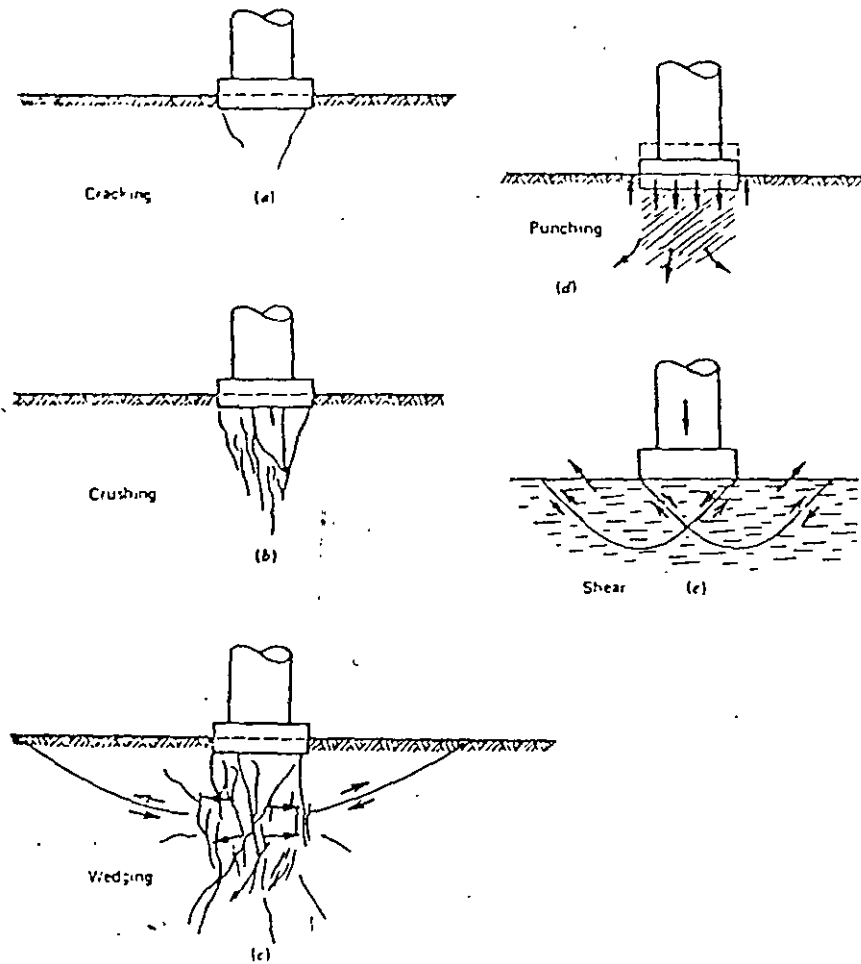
Modes of failure of a footing on rock. (a), (b), and (c) Development of failure through crack propagation and crushing beneath the footing. (d) Punching through collapse of voids. (e) Shear failure.
